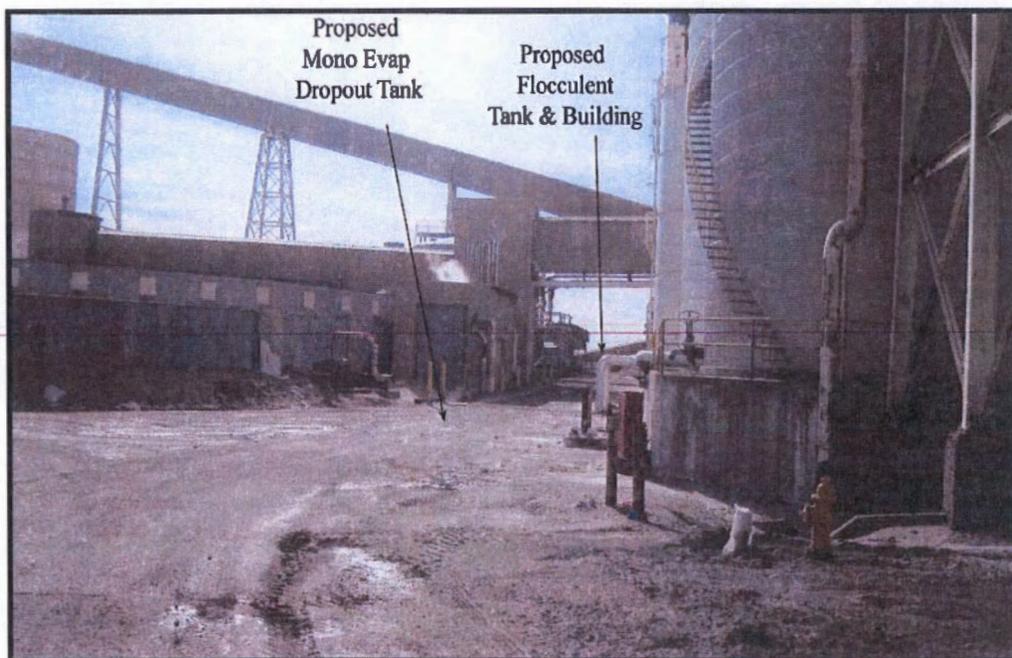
The project photo shows existing facilities and disturbances in the area proposed for the new Mono Evaporative Dropout Tank and the proposed Flocculent tank and building. The photo was taken on March 27, 2012, by Joni Stainbrook.
